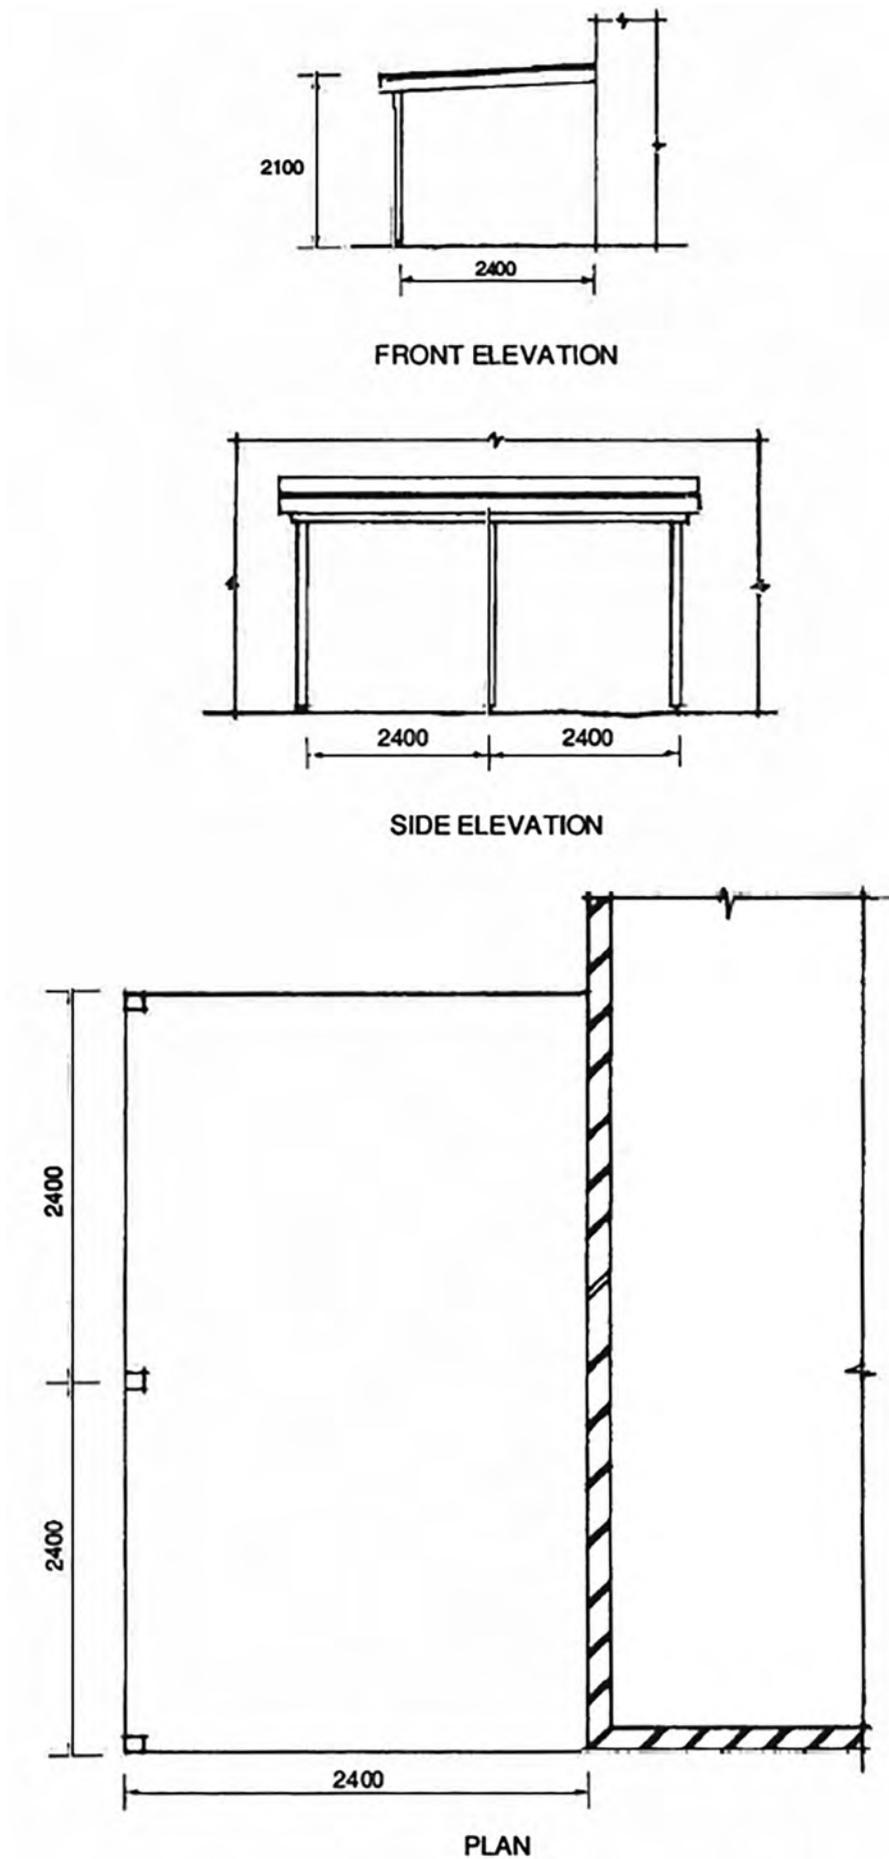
LEAN-TO GARAGE PLAN AND ELEVATIONS
